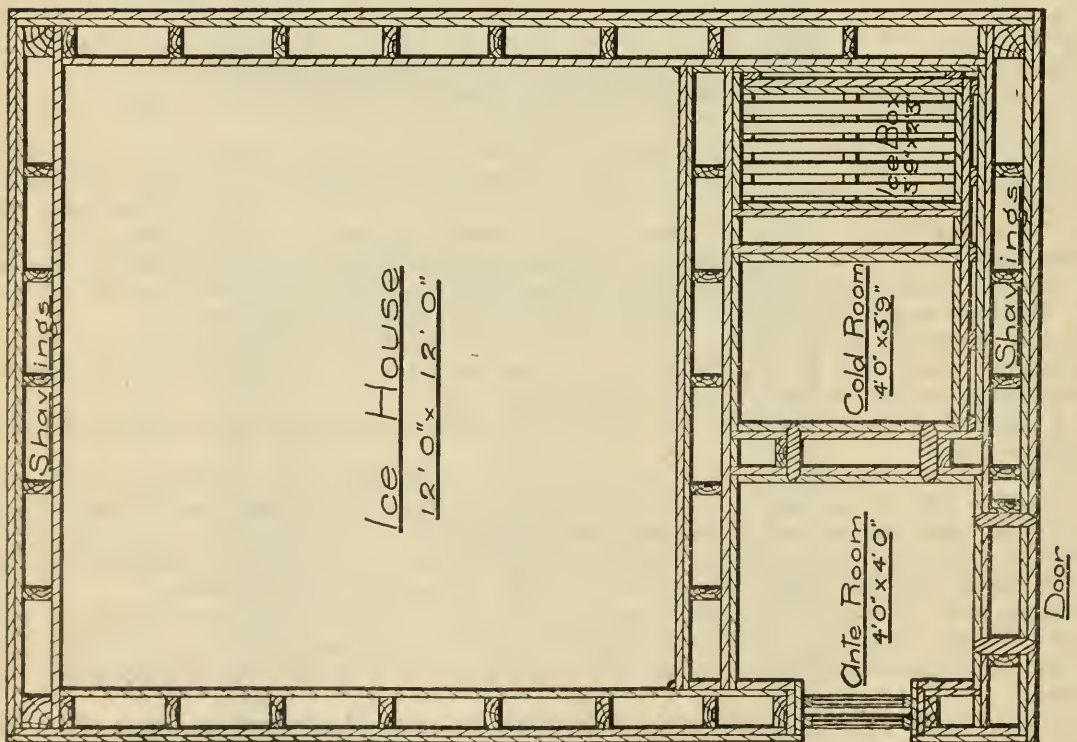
Plan of Small Cold Storage (after Ruddick).
